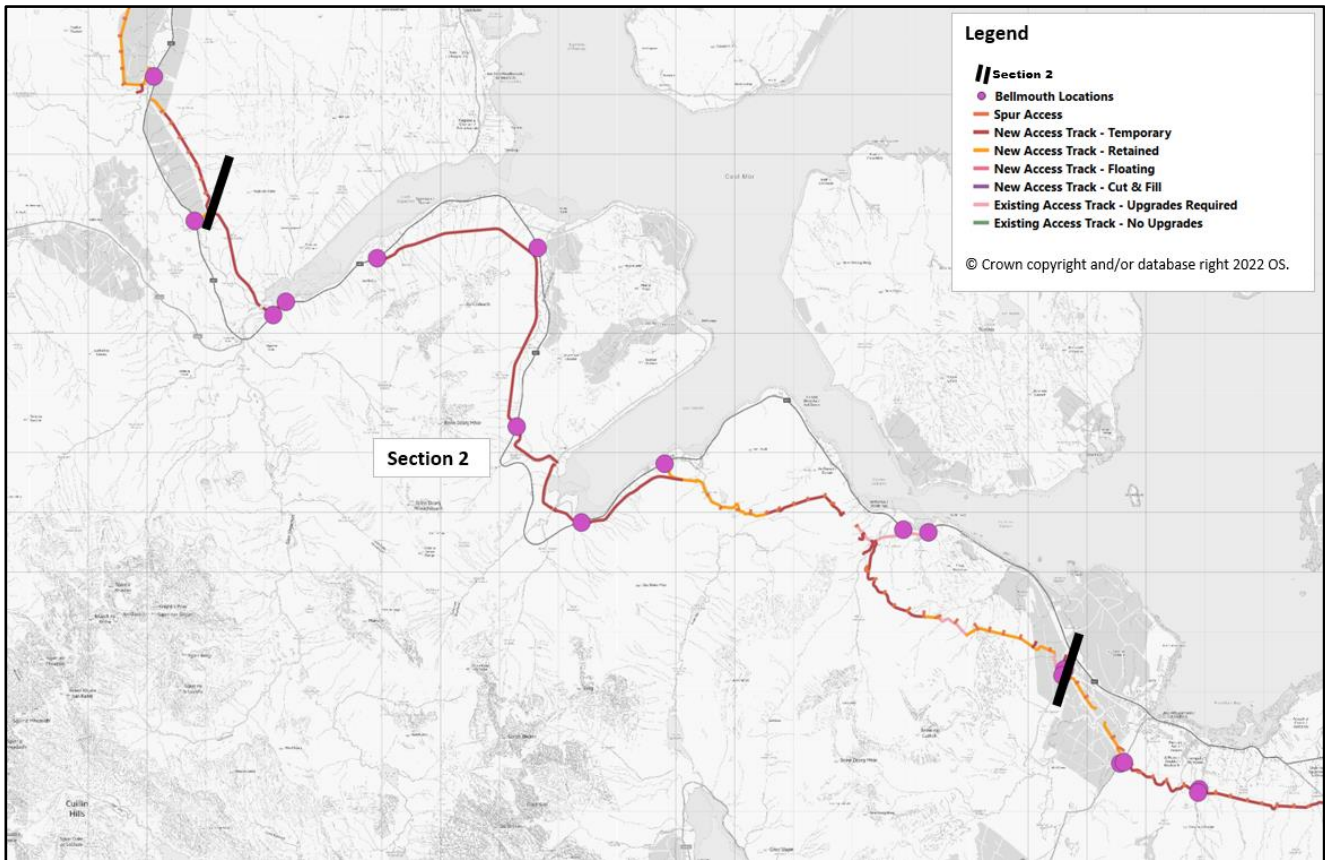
Access Locations – Section 2: North of Sligachan to Broadford
